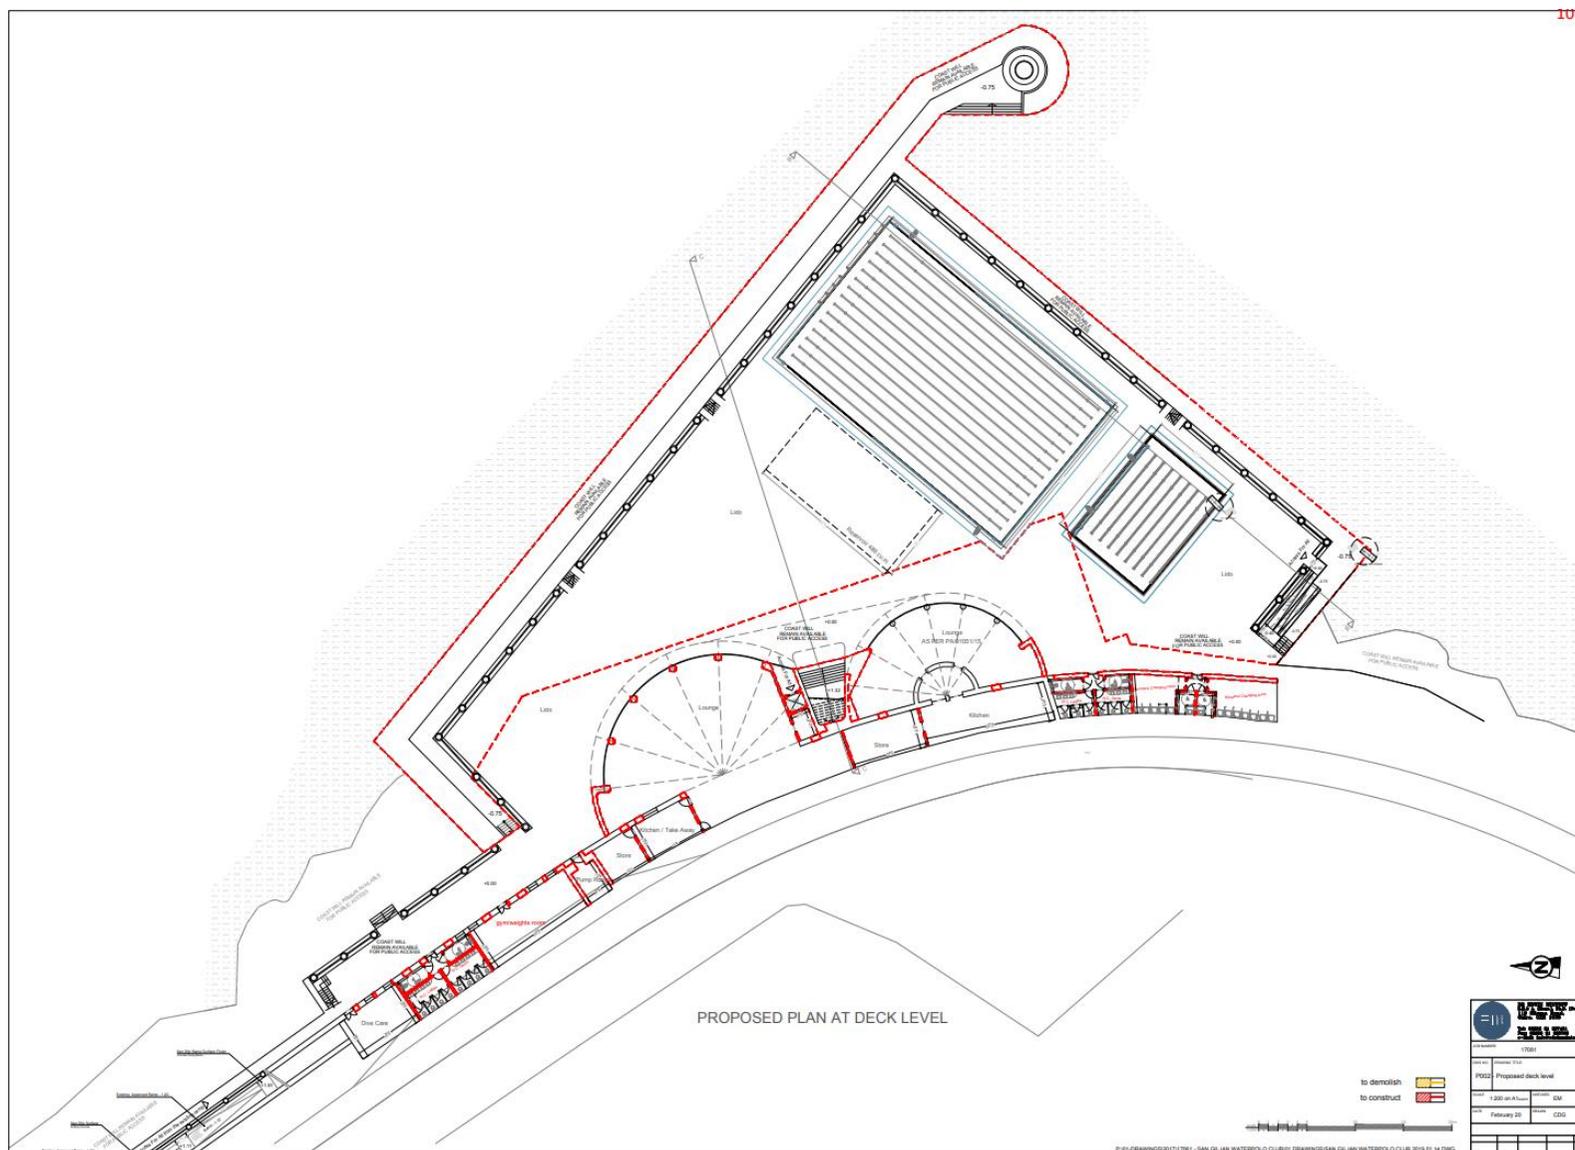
Proposed plan at deck level (Source: *E-apps PA/03927/19/107b*).
